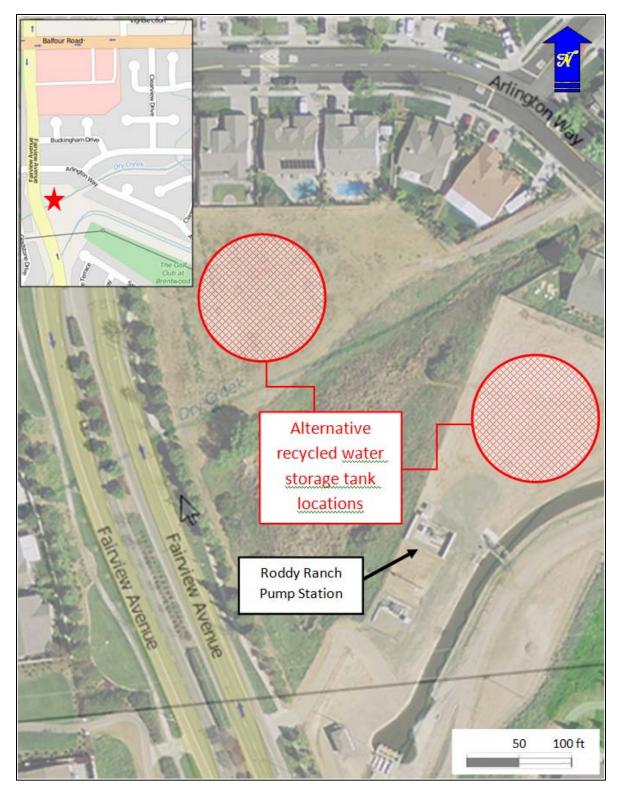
Site Plan for Recycled Water Storage Tank at the Roddy Ranch Pump Station Location.
